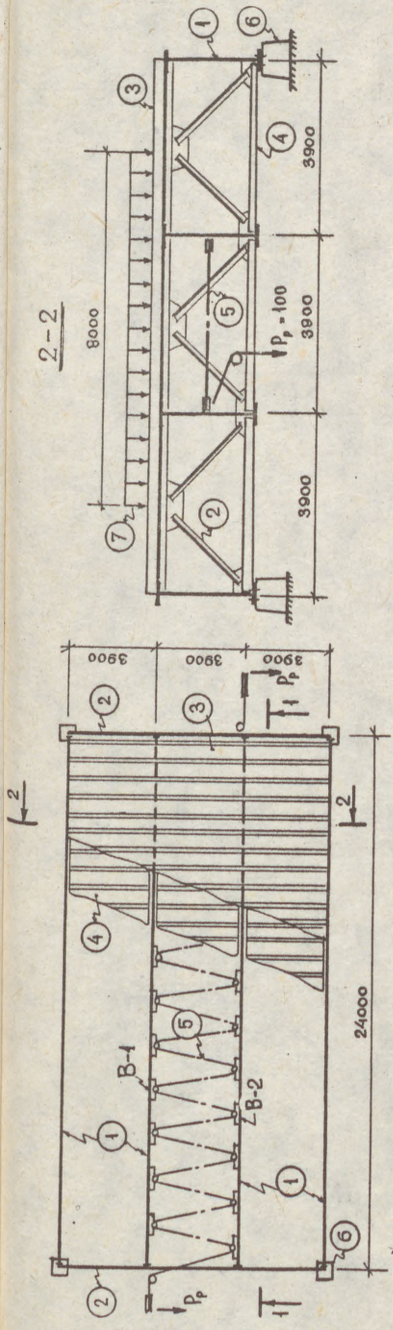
Test roof-block. 1 - thin-walled girders; 2 - secondary trusses; 3, 4 - corrugated steel sheeting on top and bottom flanges; 5 - tackle block, imitating load upon girder webs due to air pressure; 6 - supports; 7 - vertical distributed load; 0 - apparatus used to record deflections of girders.
